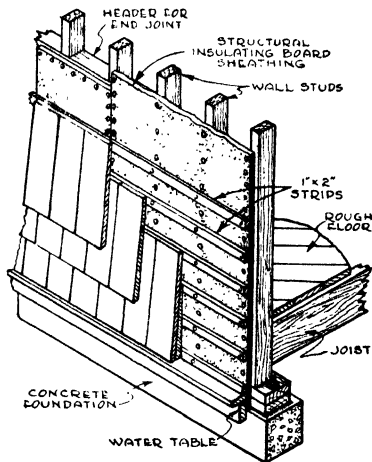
Structural Insulating Board Used as Sheathing under Shingles
